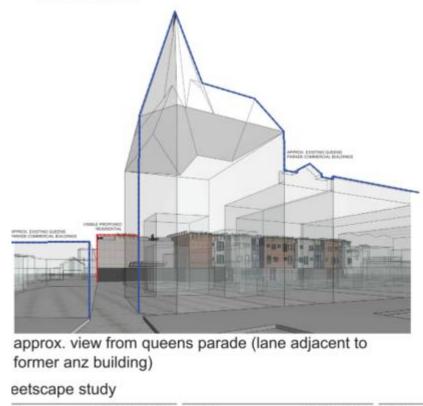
Perspective of development behind ANZ building (370 Queens Parade) as viewed from north-west footpath of Queens Parade via adjacent laneway.
